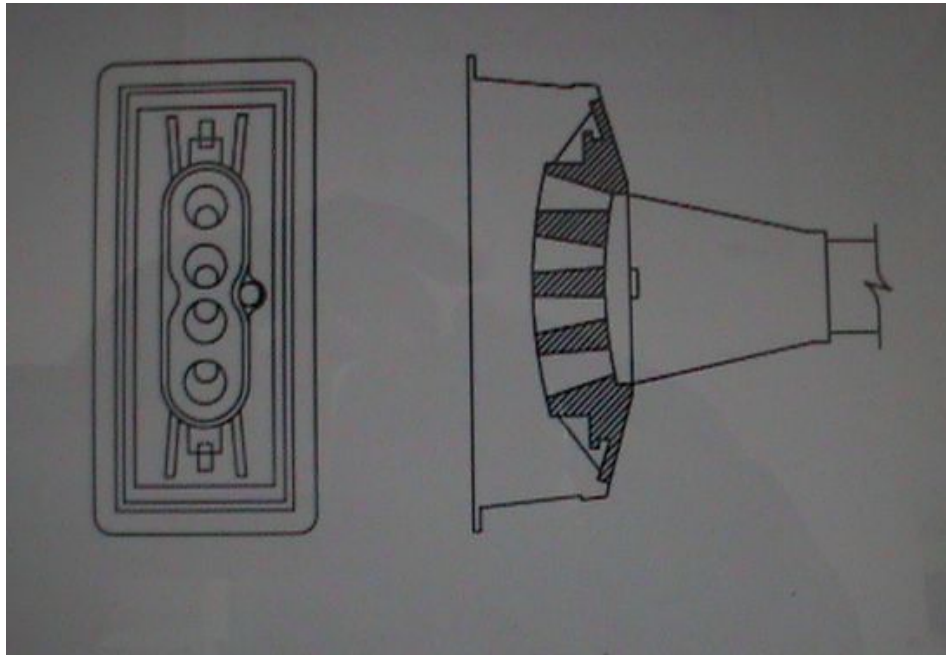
Multistrand anchorage for pre-tensioning concrete [44].
